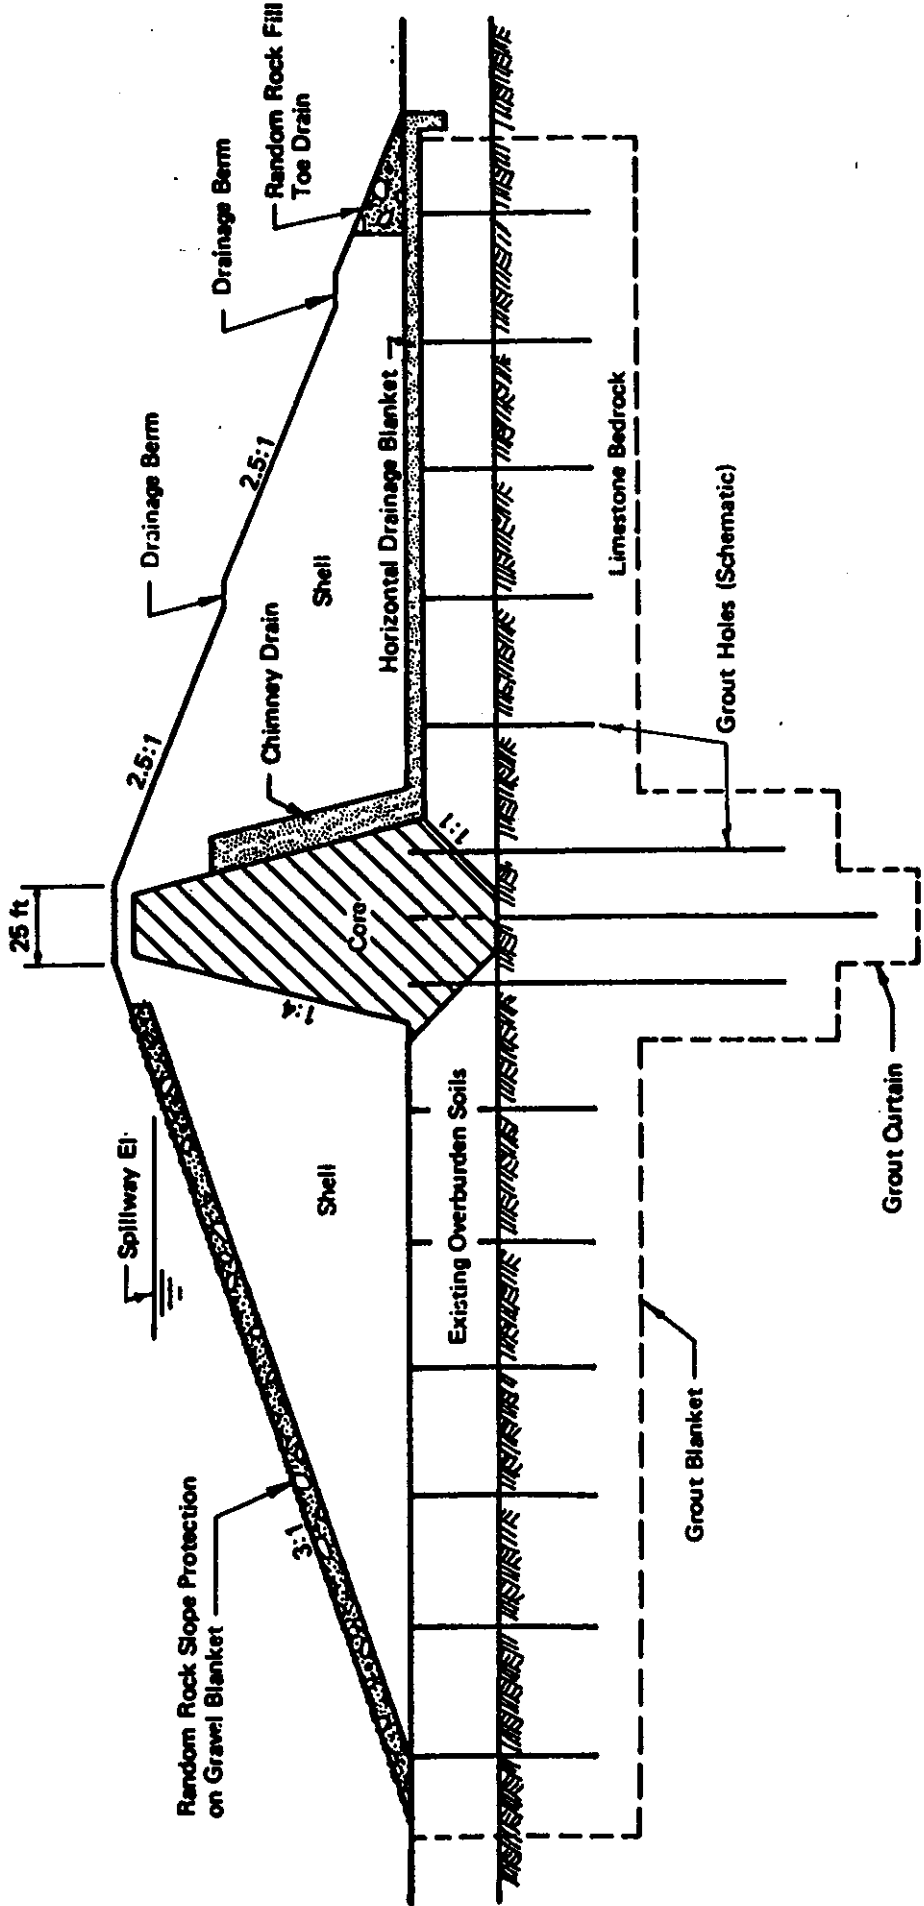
shows a typical dam section at Spruce Run Reservoir.
